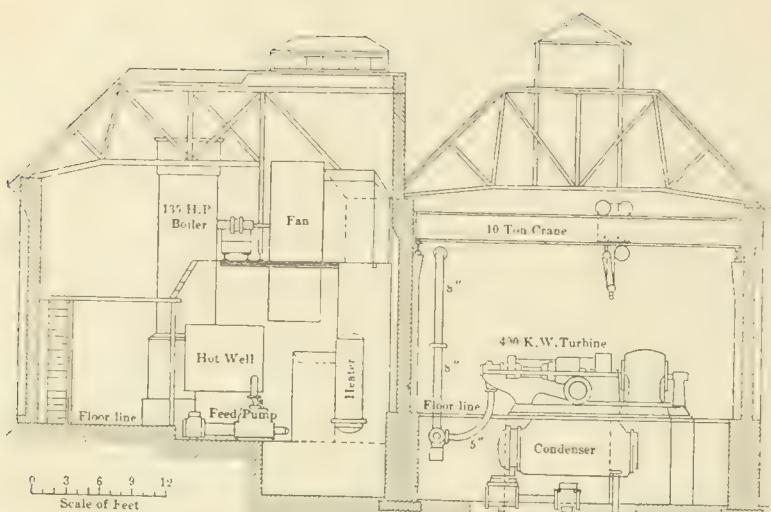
SECTIONAL ELEVATION OF POWER AND BOILER-HOUSES.
